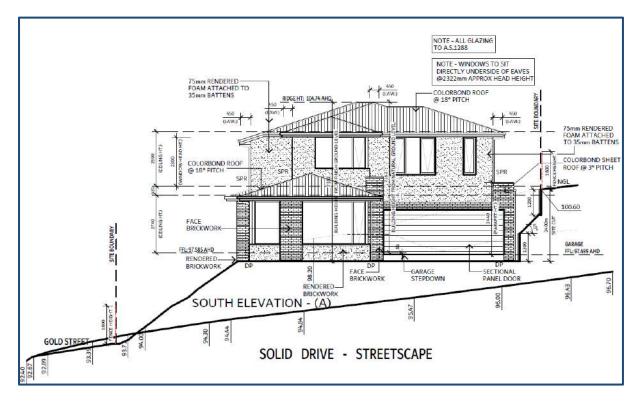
Previously Proposed South Elevation Viewed From Solid Drive
